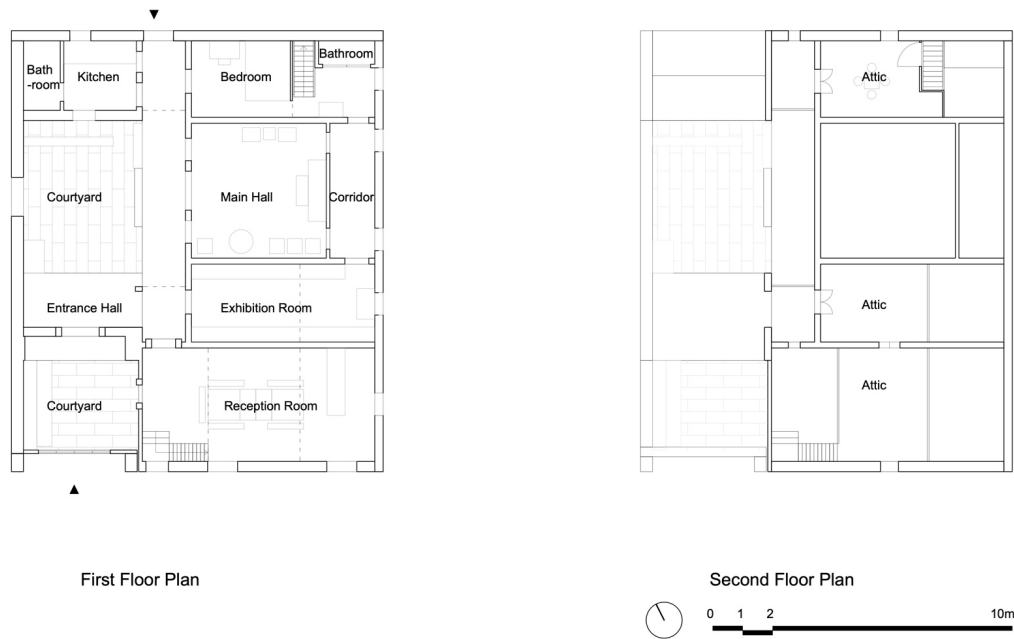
Floor plan of the renovated ancient house, Building 34. (Source: Author, 2024).
